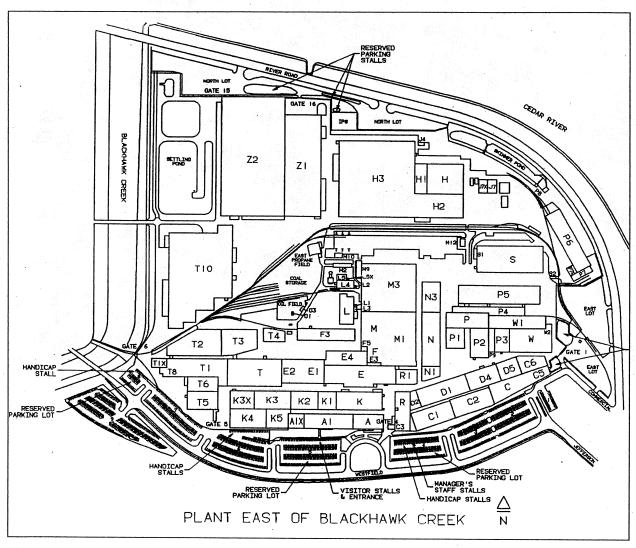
Westfield Ave. John Deere site plan, about 1990. Since this plan was drawn, a number of buildings south of the railroad tracks have been removed, including the M foundry buildings in the center and most of the T storage and shipping buildings on the west end. Courtesy Deere & Co., 1993
